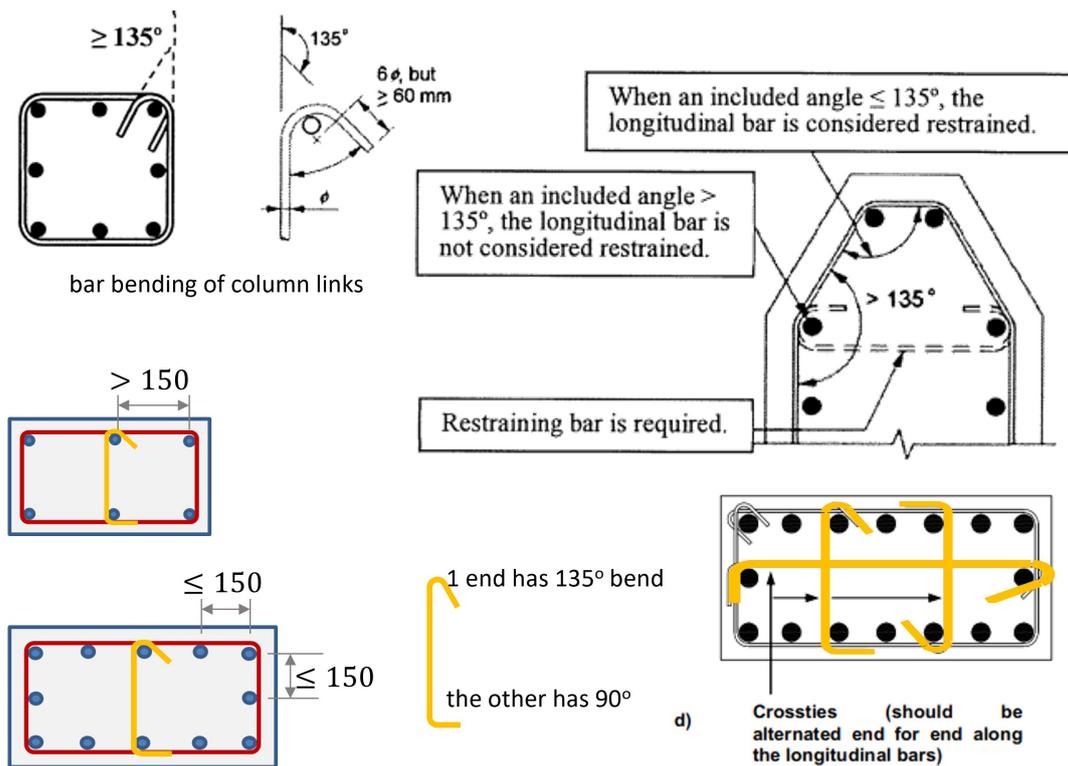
Detailing of transverse reinforcement in columns, showing the arrangement of links and cross-ties to provide confinement and restrain longitudinal bars.
